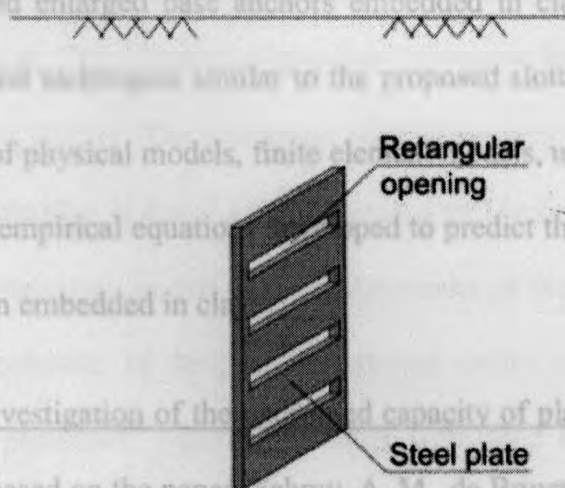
5: The proposed anchor system: a steel anchor with intermediate rectangular openings.
